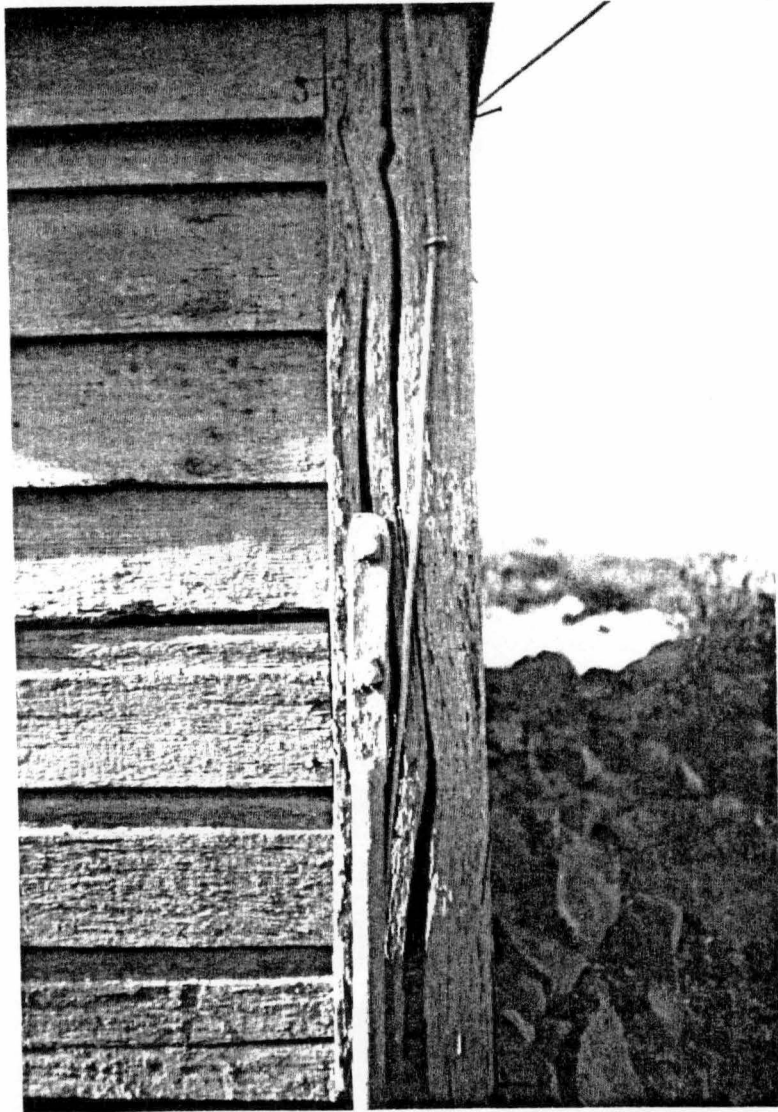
Split Cornerboards and Siding. Ollalie Mountain Lookout Station, 1991. Source: Author.
